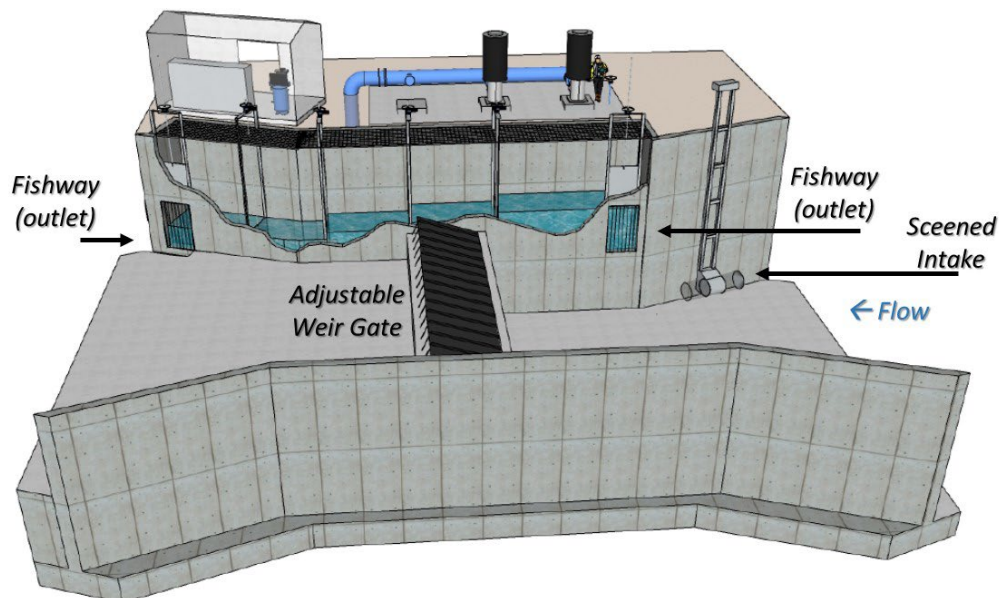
Conceptual design for the proposed weir, intake pump station, and fishway at the outlet of College Lake (Source: cbec 2020).
